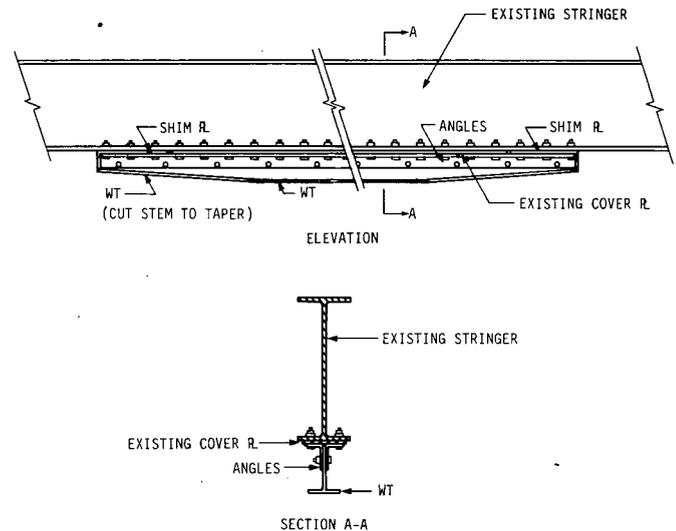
Strengthening of existing steel stringer by addition of structural tee section.
